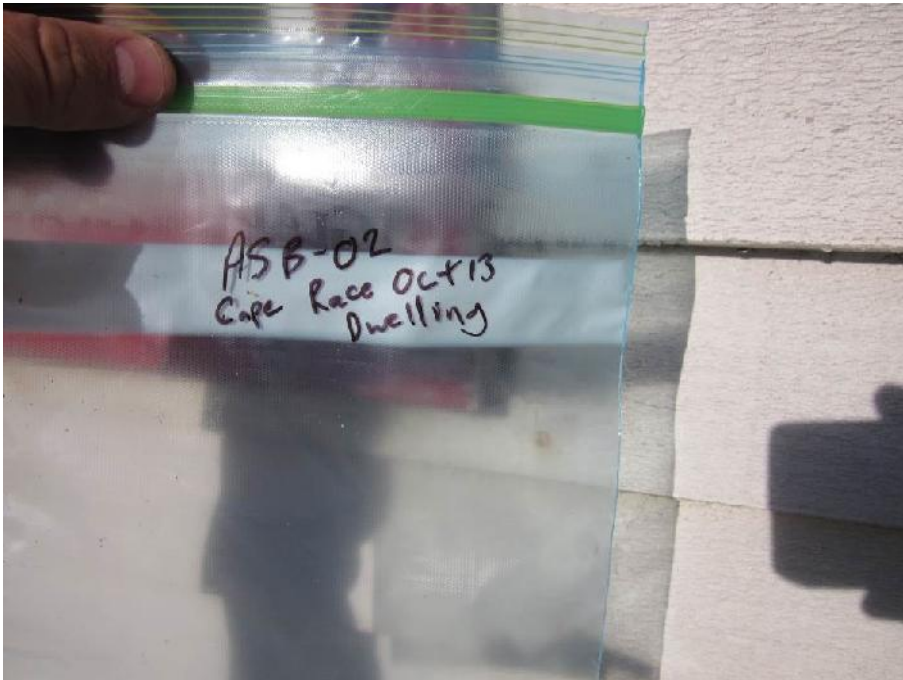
View of location of caulking sample ASB-02 (exterior window frame).
